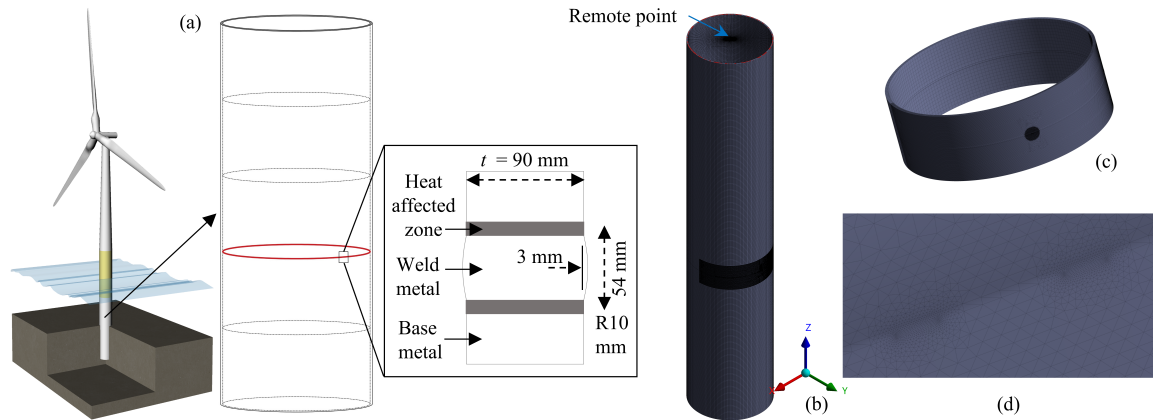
Graphical representation of a typical offshore wind turbine monopile foundation, illustrating the studied weld geometry and its dimensions. (a) The examined surface cracks are located at the circumferential weld toe marked with a solid red line, (b) monopile FE model representation, also showcasing the remote point where the bending moment is applied, (c) local mesh near the circumferential weld region, and (d) refined mesh representation at the semi-elliptical cracks' location.
